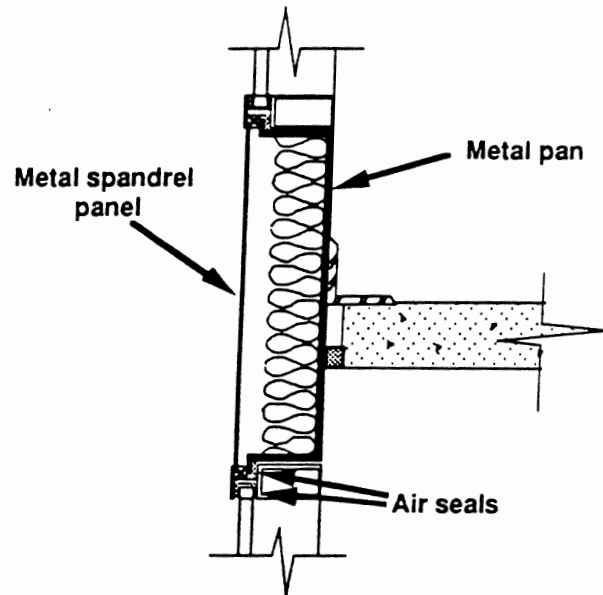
Curtain Wall Air Barrier (Perreault 1989)
